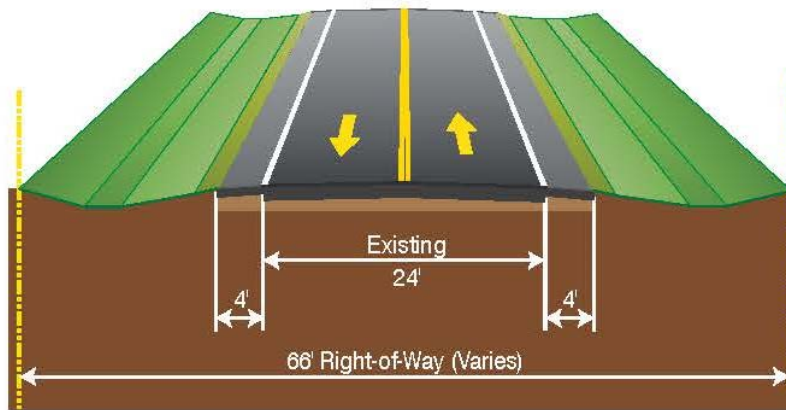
4 Existing Typical Section from Enchanted Lakes to Marie Street
